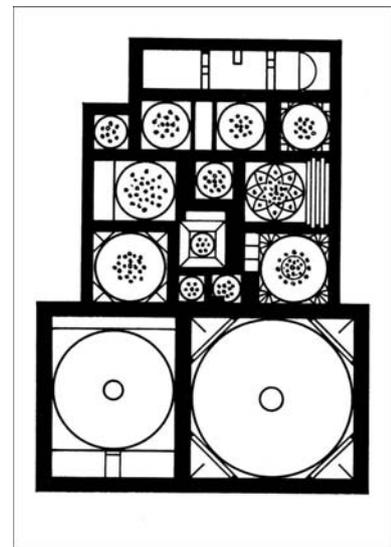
Floor plan of *Çifte hamamı* (plan P. Dikidžiev)
